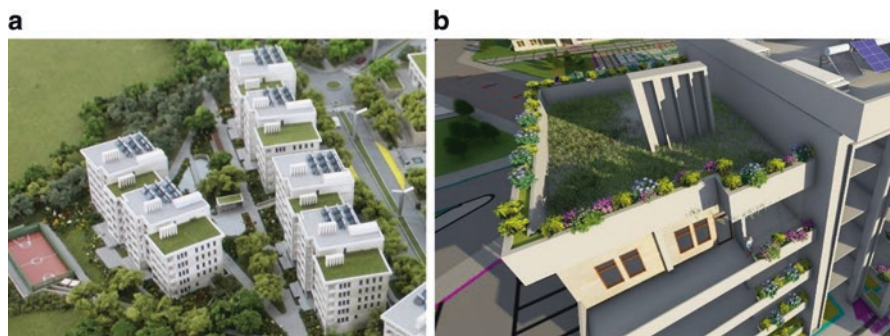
(a) A group of apartment blocks designed with green roof. (b) Green roof and chimney
